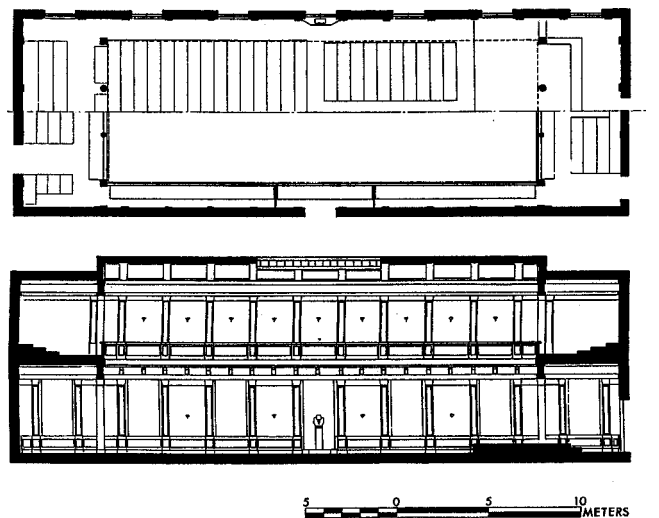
Vienna, Brahmsaal, VB, plan and section.
